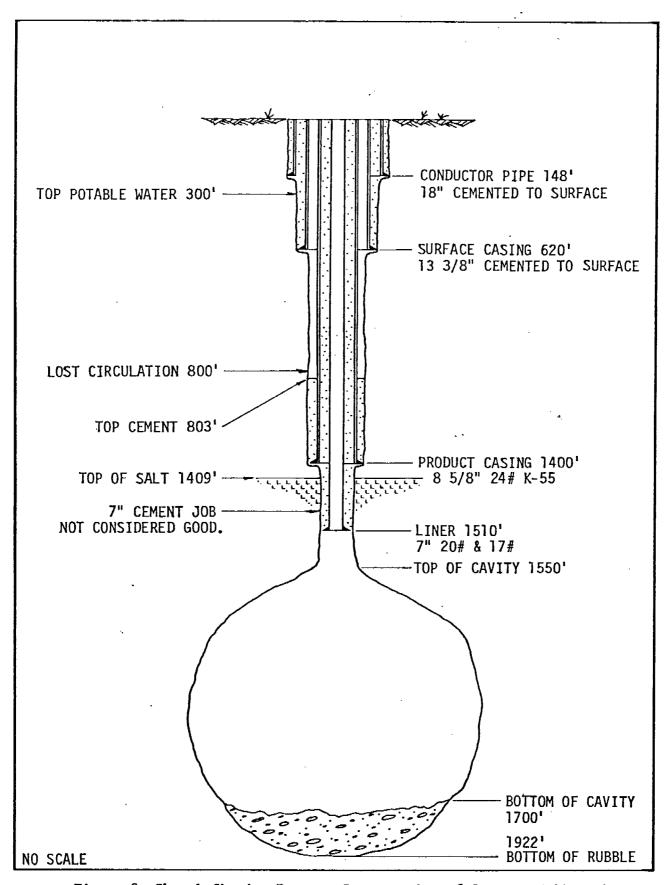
Sketch Showing Present Construction of Storage Well No.1
